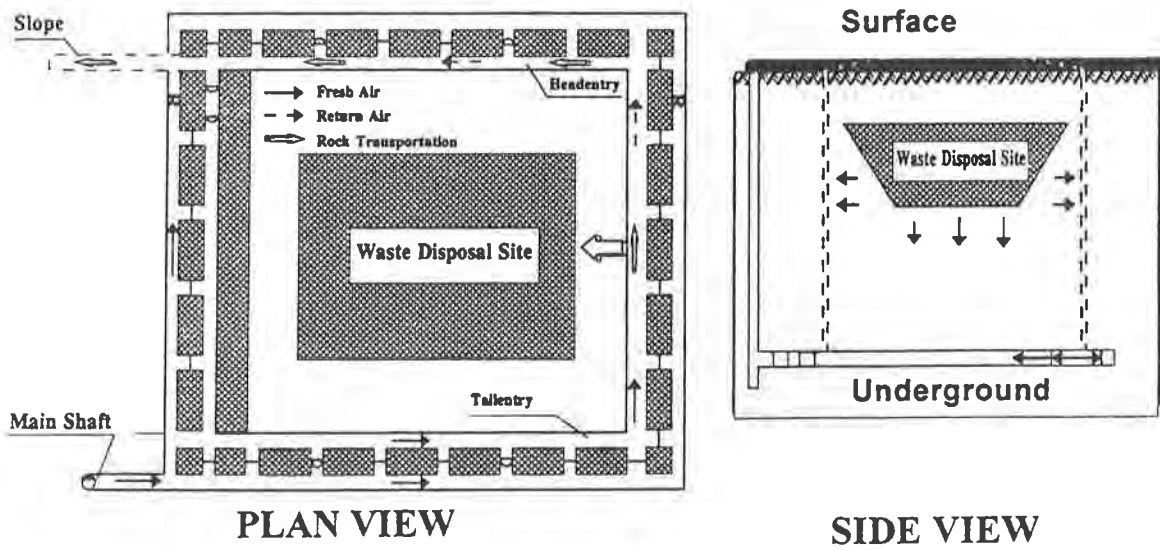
Conventional longwall development illustrating the vertical shafts and development tunnels.
